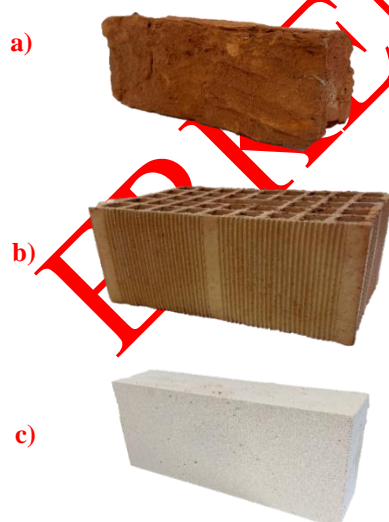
Units used in the production of masonry structures; a) clay brick, b) Vertical hollow brick, c) Aerated concrete block
